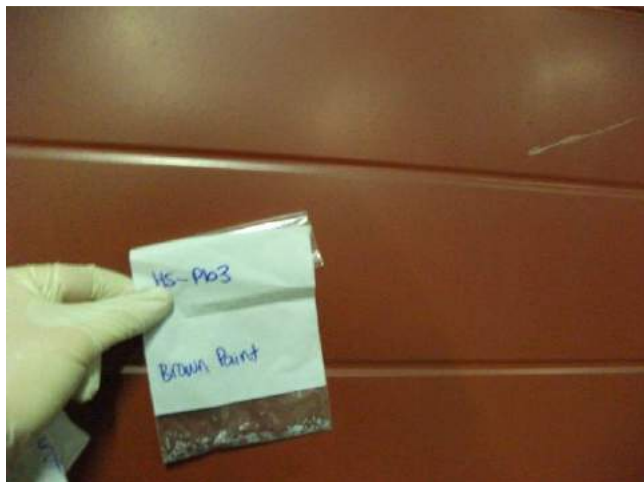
Heated Storage Building – Lead-Based Red Door Paint
